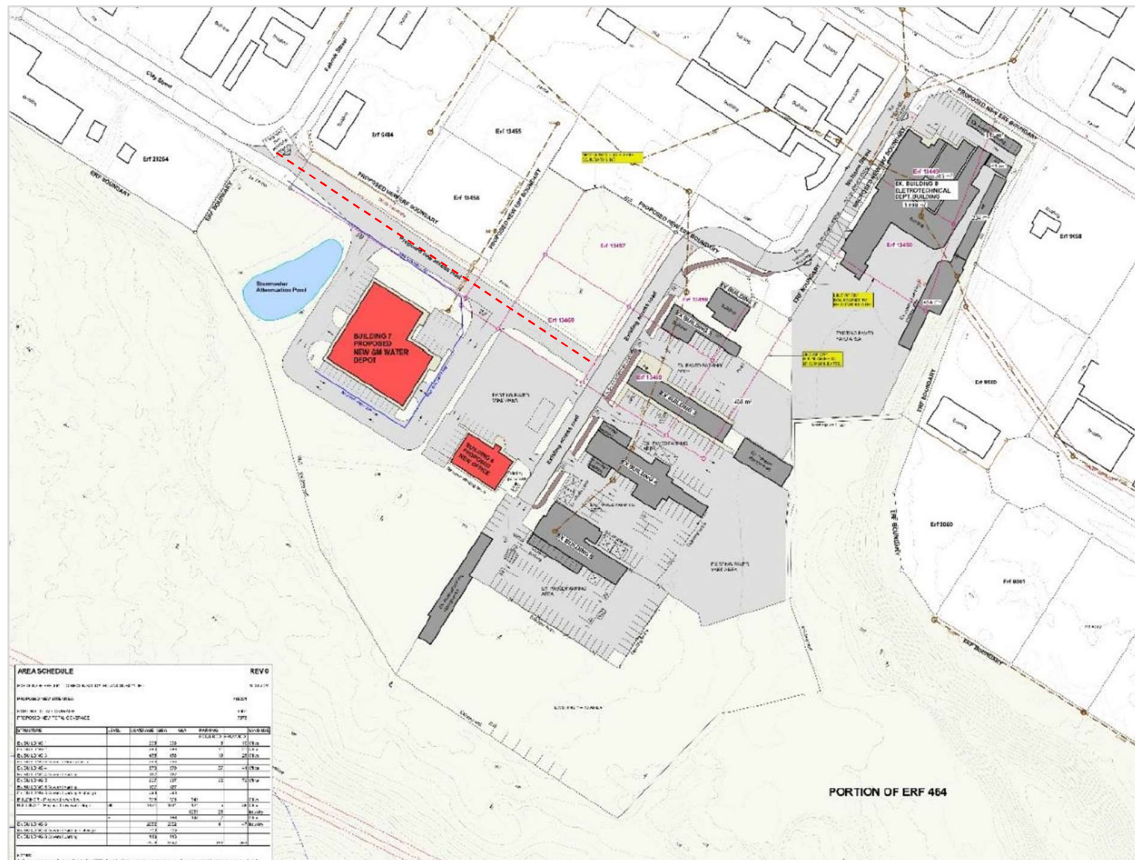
Site development plan showing the proposed new buildings in red, a proposed new road as indicated by the red dashed line, and a stormwater attenuation pond in blue.
